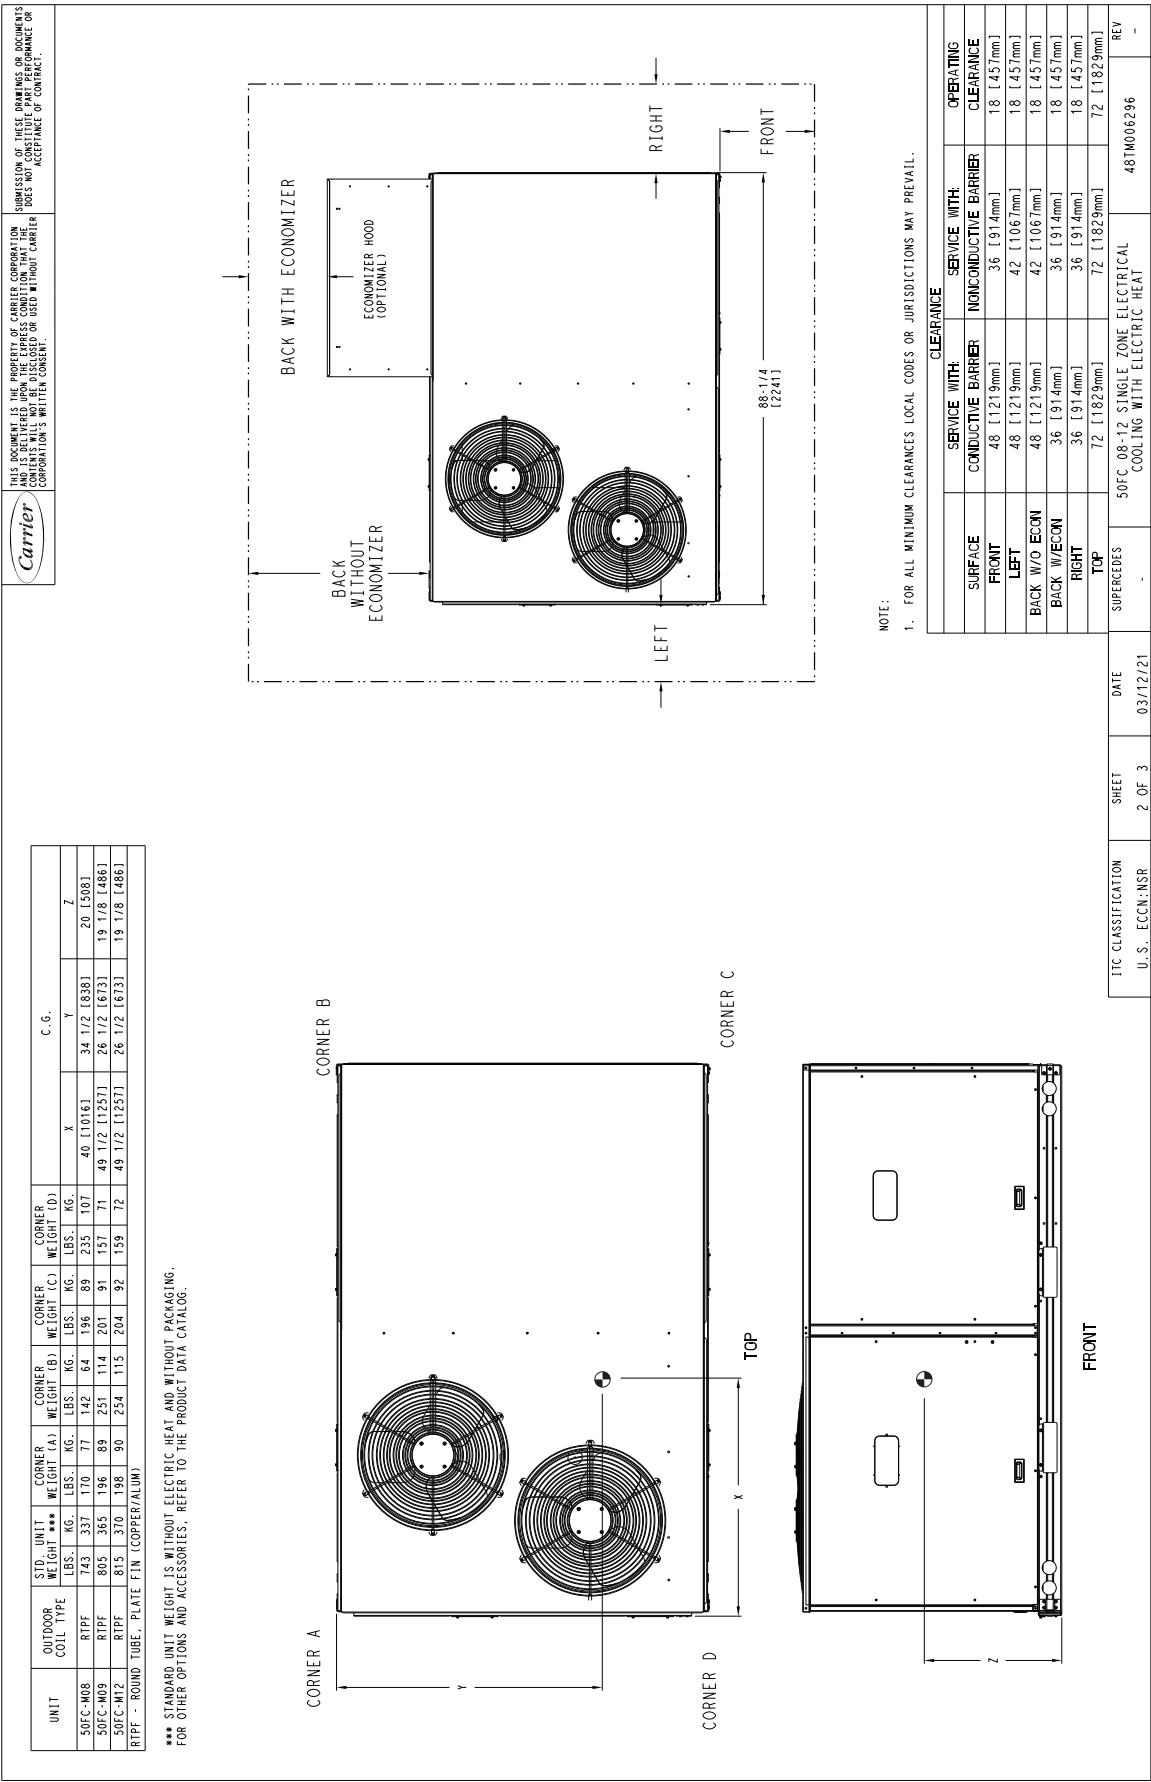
50FC08-12 Dimensional Drawing (cont)
